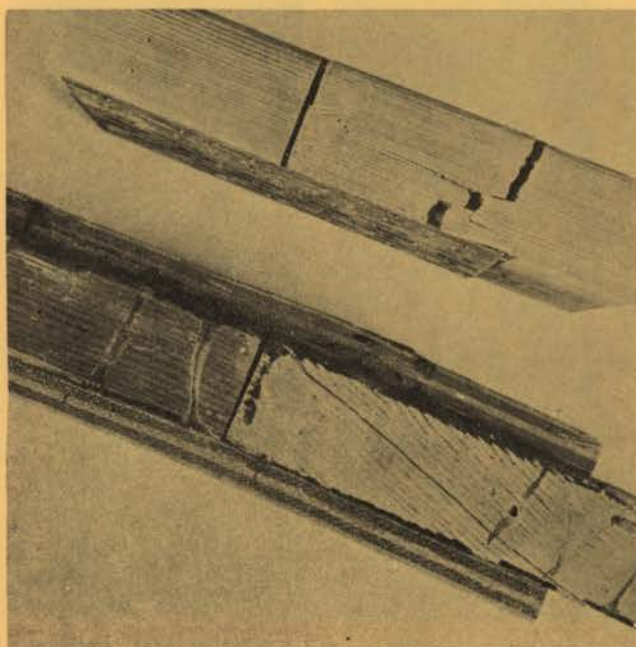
Brash-type wood failure above and cross-grain failure below.
